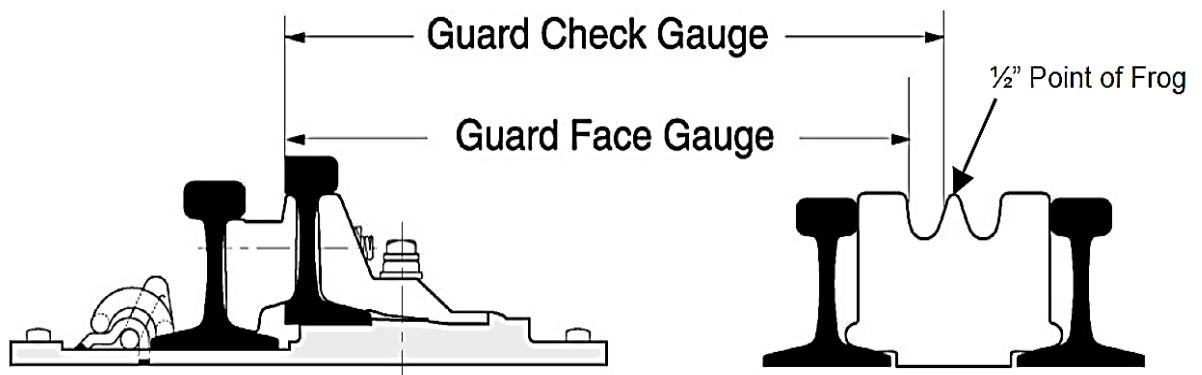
Figure SUB-PART D – 80 – Guard Check Gauge and Guard Face Gauge Measurement Locations
